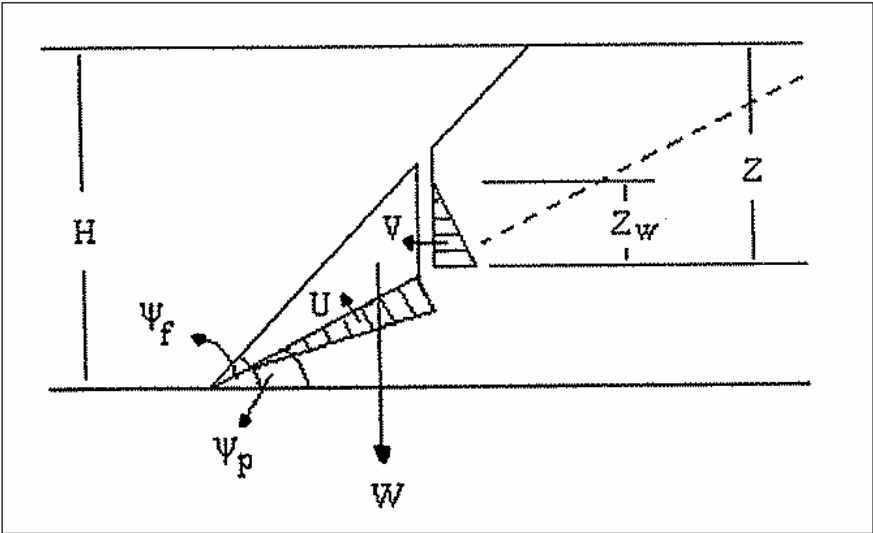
Forces acting on a block on a failure plane of a slope with a tension crack in its surface (Hoek and Bray, 1981)
